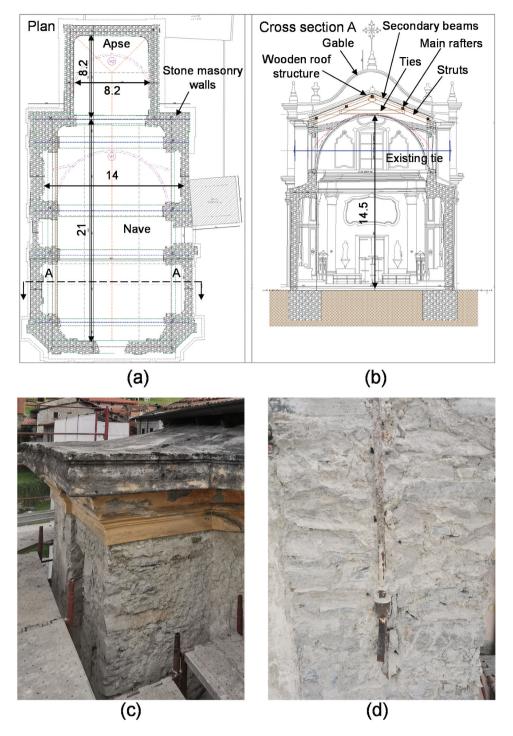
Plan (a) and cross section (b) of the case-study church (dimensions in m); particulars of a stone masonry wall (c) and of an existing metal tie (d).
